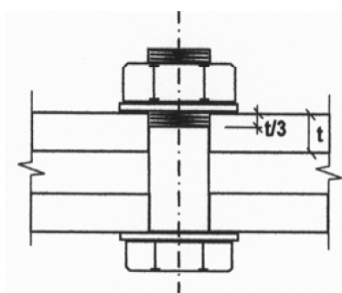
Threaded portion of the shank in the bearing length for fit bolts
